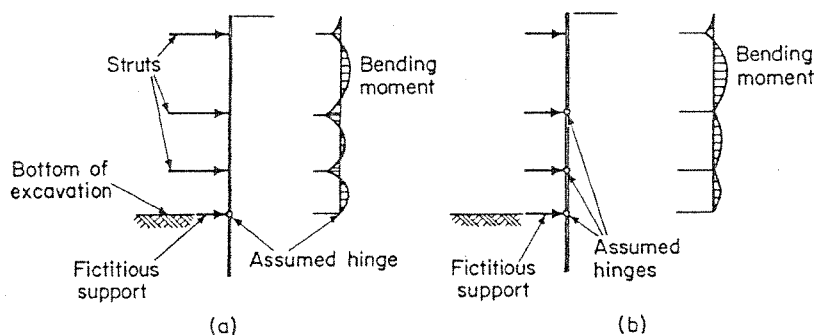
Assumptions used in the design of sheeting and soldier beams: (a) sheeting and soldier beams; (b) soldier beams (alternate design).
